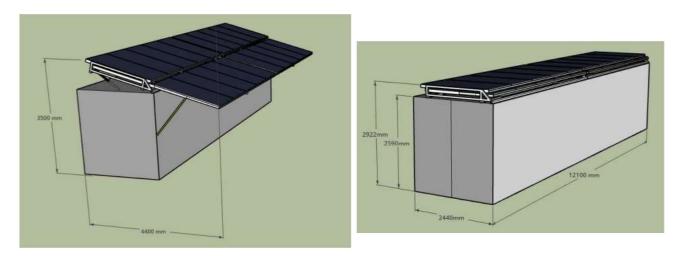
Power Plant Room with rooftop solar array open and closed
